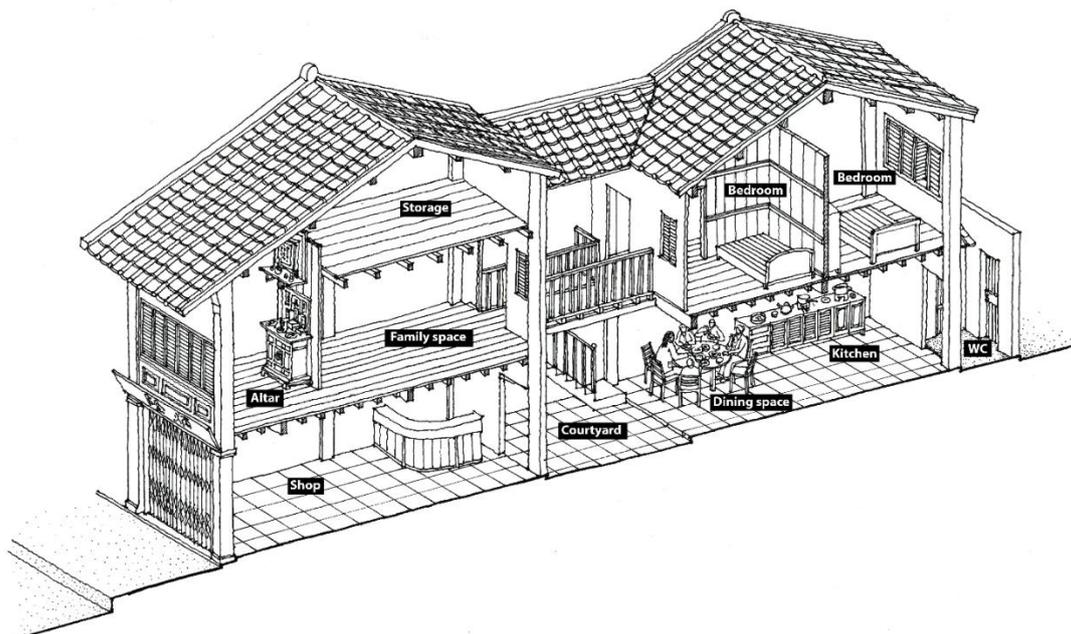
Section of a Chinese townhouse in Hà Tiên.
